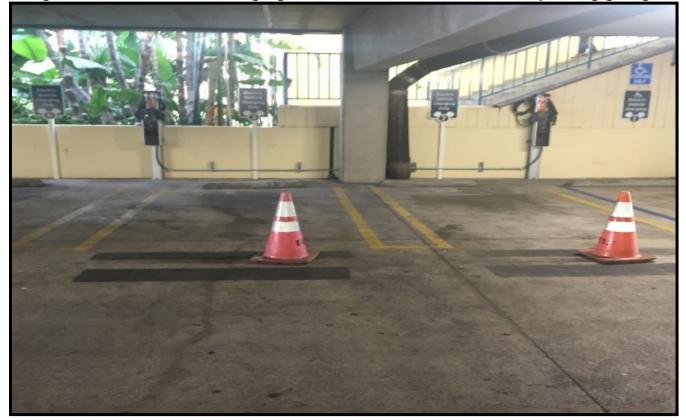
Installed EV charging stations at Paradise Pier Hotel parking garage
